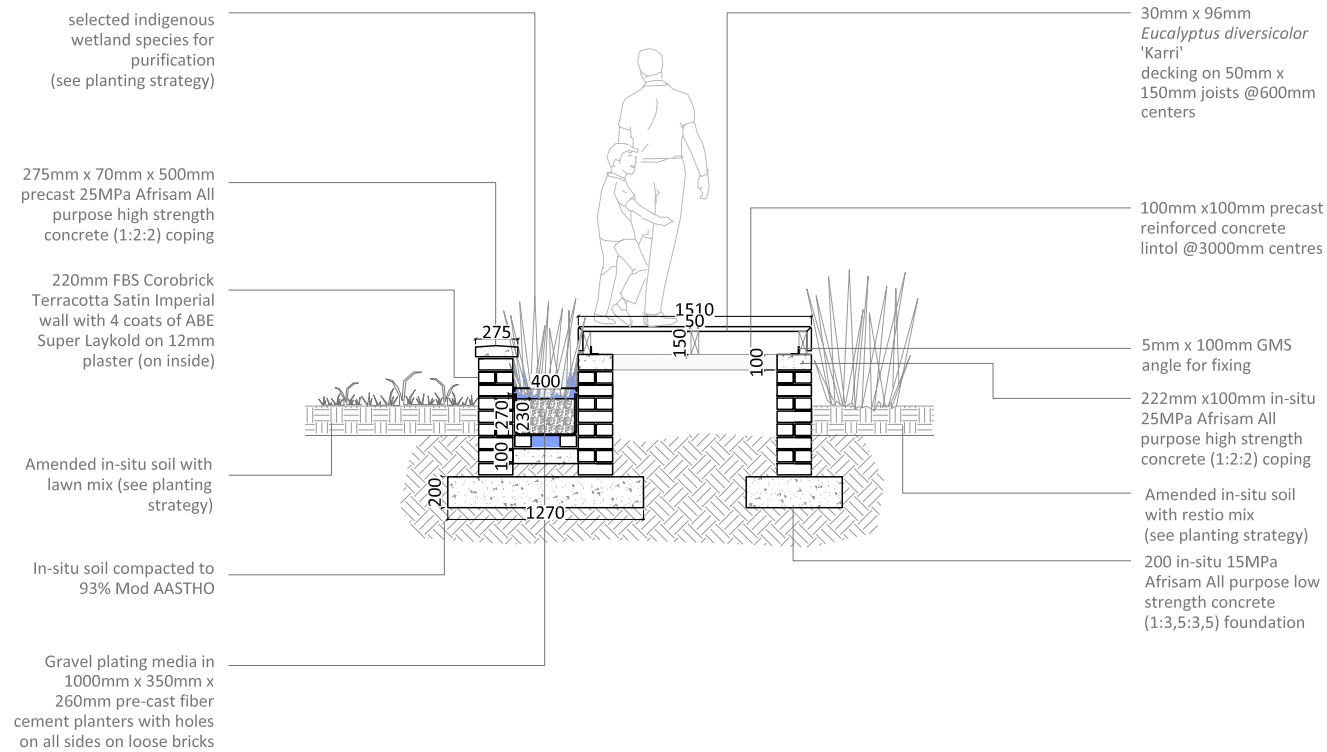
SECTION KK - SECTION AND ELEVATION LL OF RIVER WETLAND AND DECK WALKWAY
